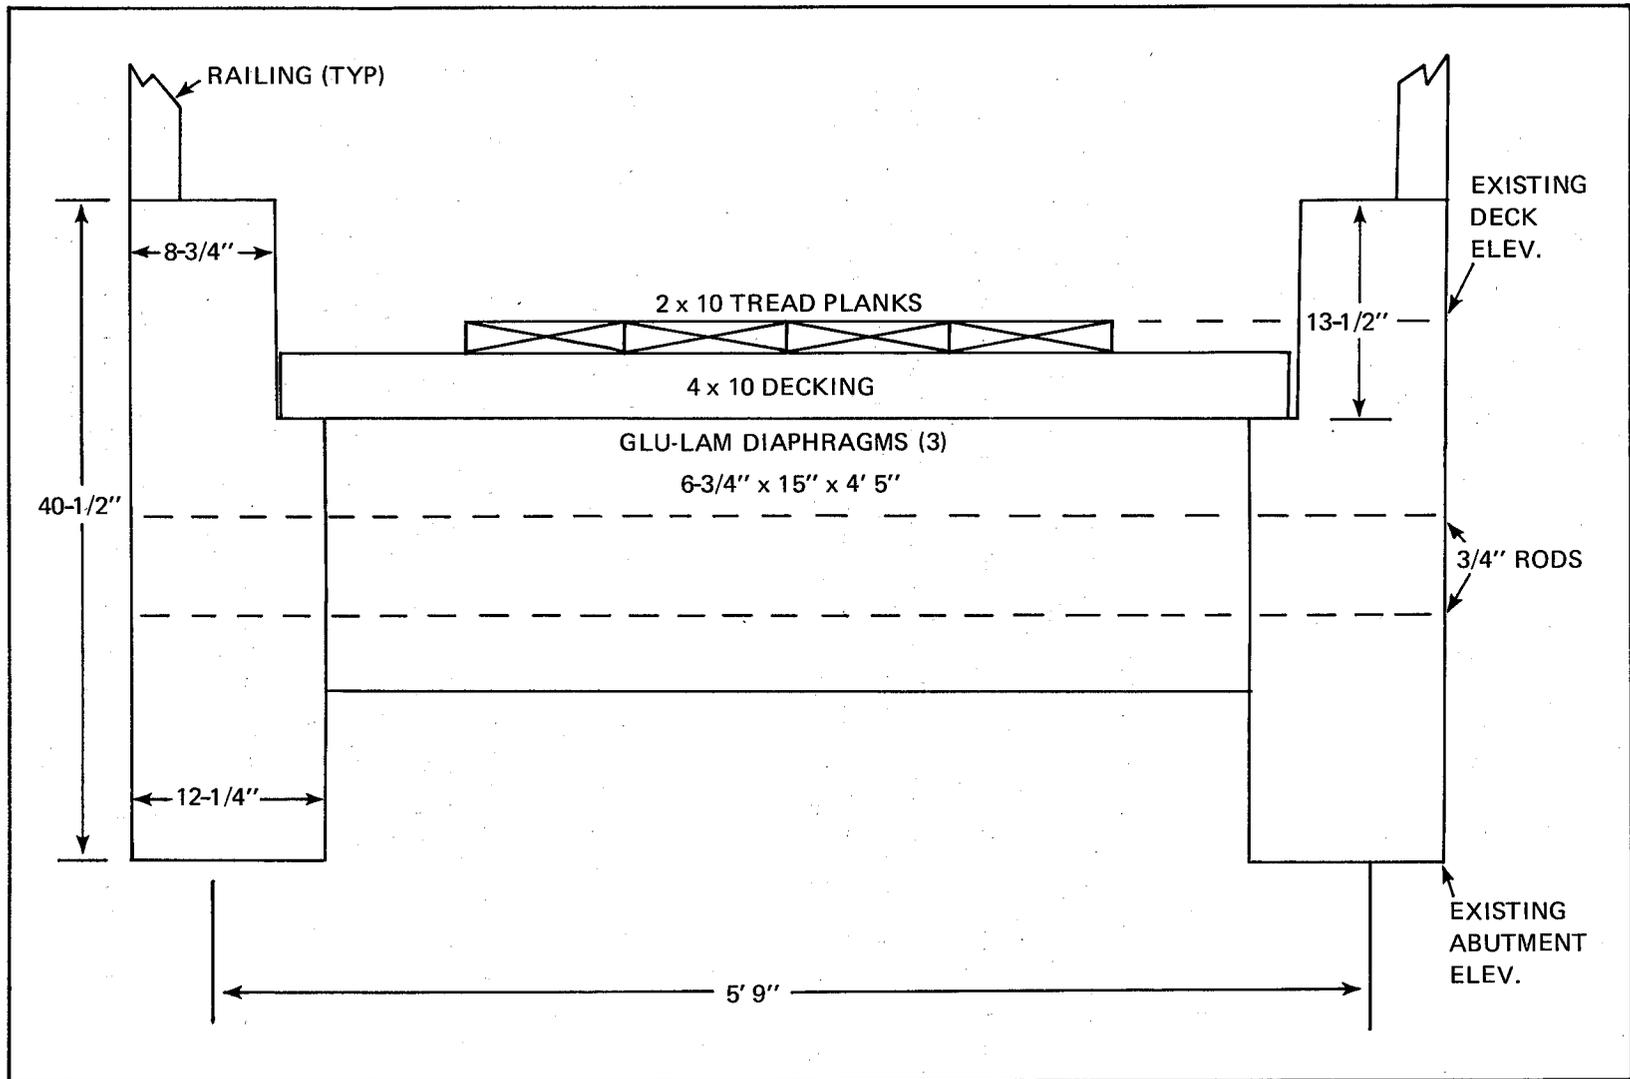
Construction of Hips or Steps to Obtain Abutment Elevation.
